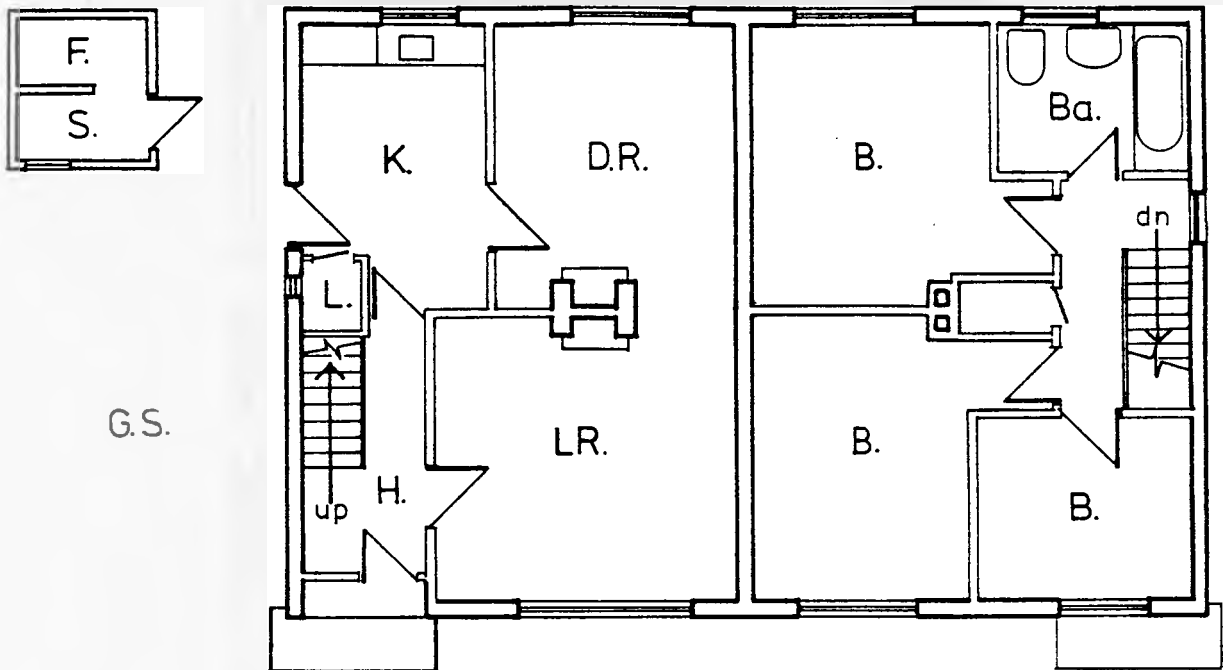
A SEMI-DETACHED HOUSE WITH GARAGE.
